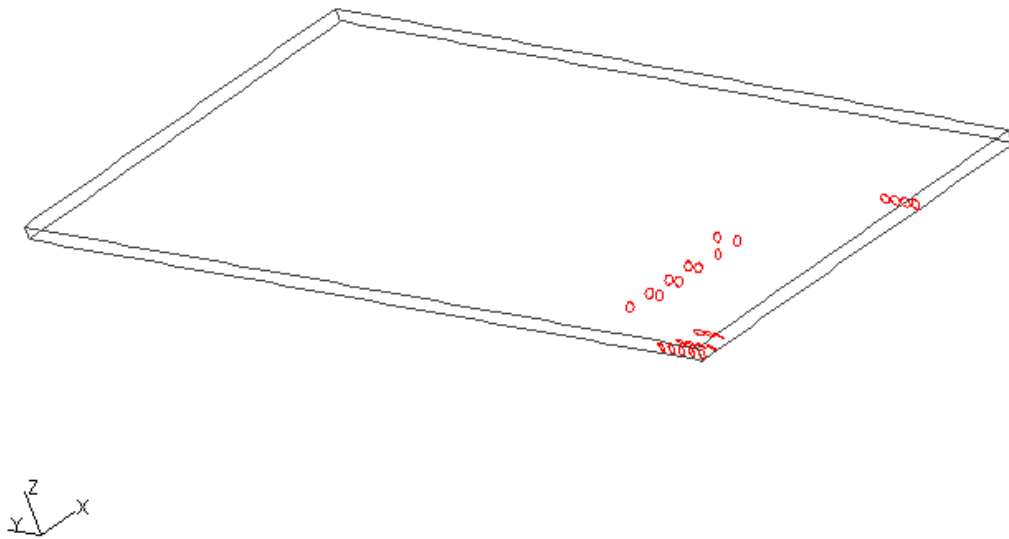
Murrah Slab Cracking On Deflected Shape At 5 msec
